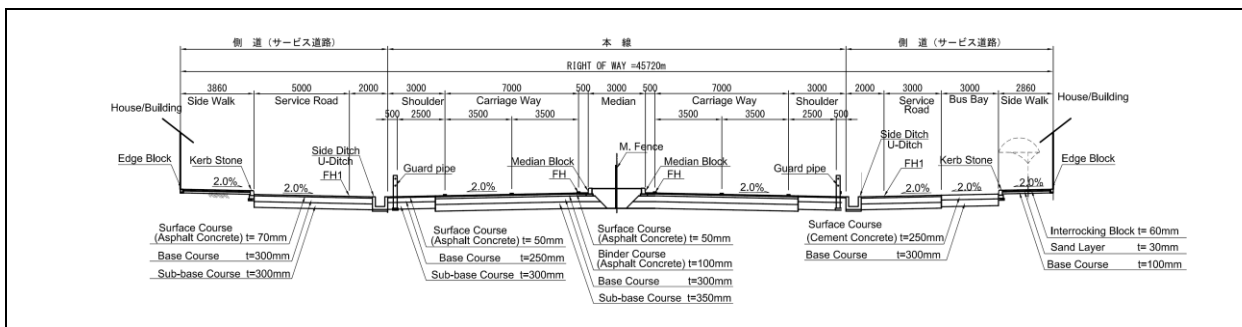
Typical Cross Section (Jagati - Sanga)
